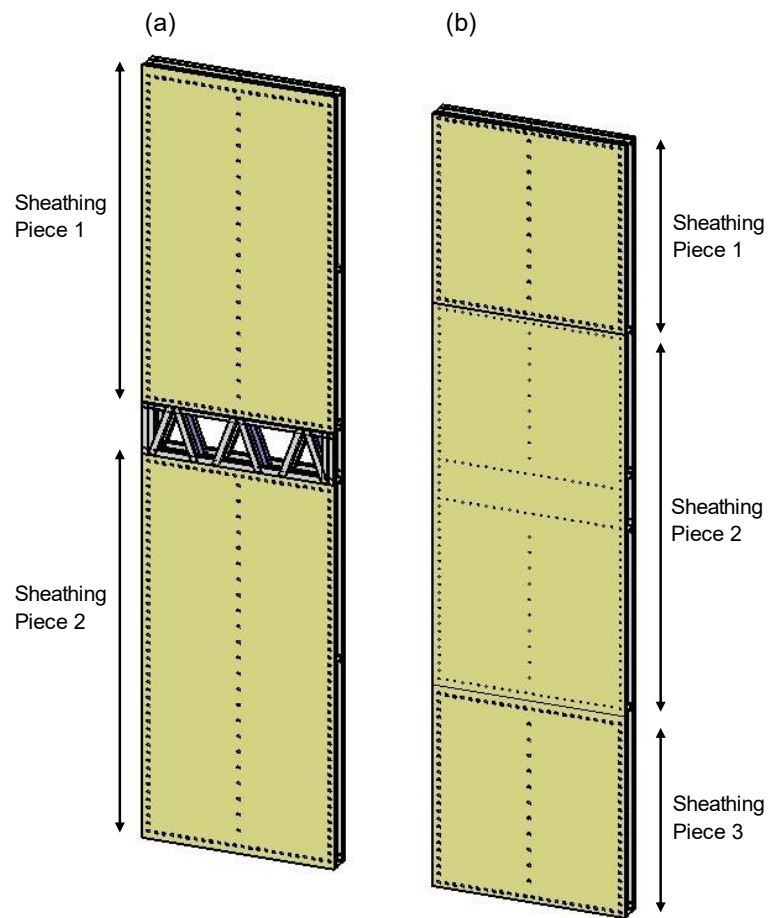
Two different sheathing configurations used for specimens: (a) sheathing each floor wall panel; (b) connecting wall panels with a sheathing
